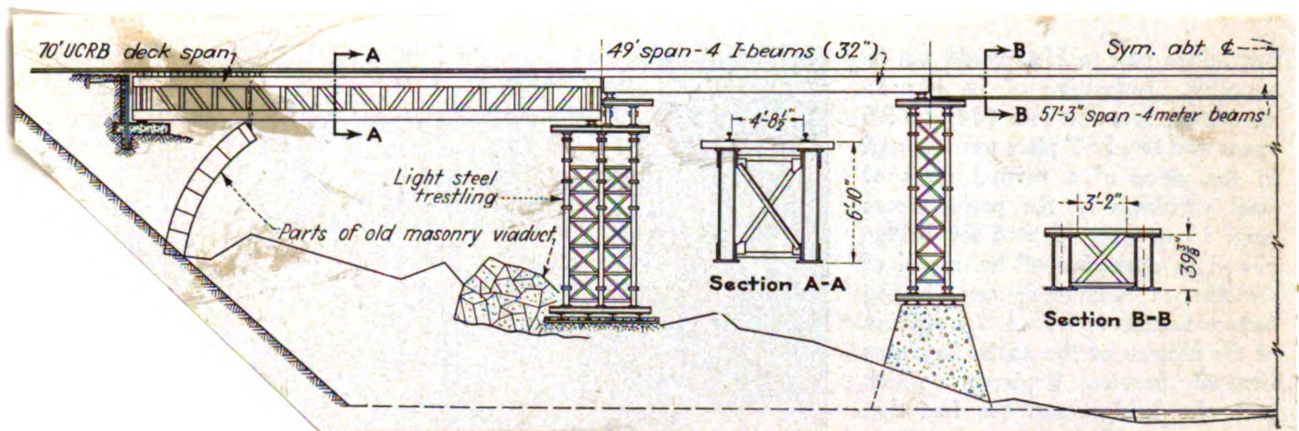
Side view of Engineer's replacement bridge at Dreux.
